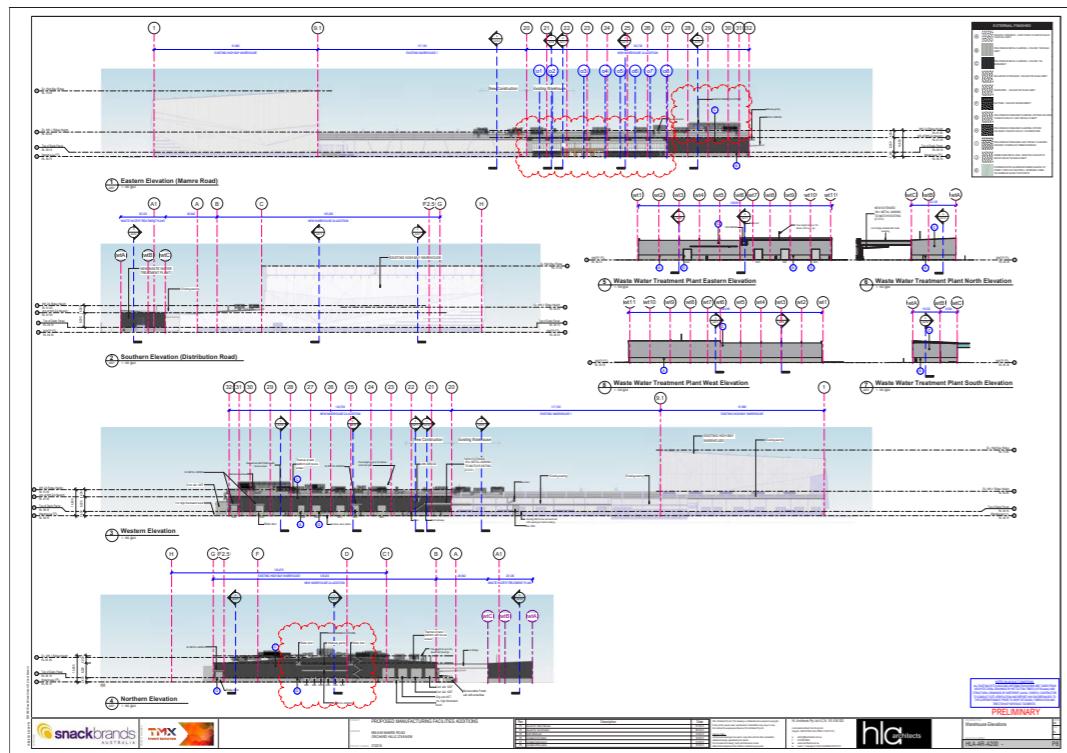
Warehouse Elevations (Source: HLA Architects)
